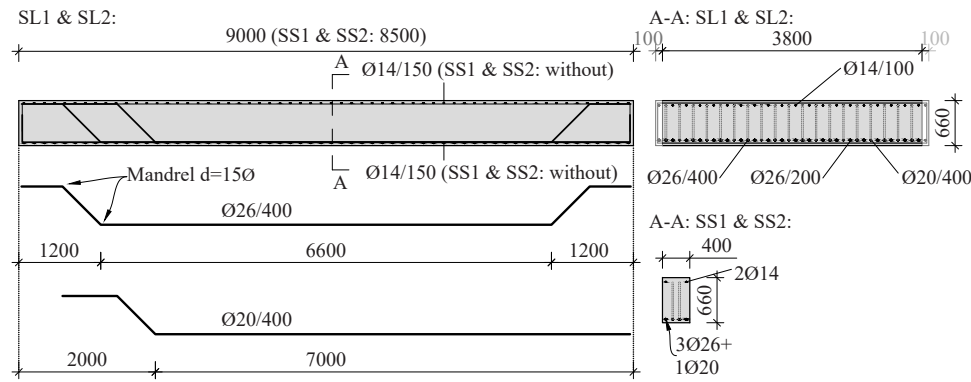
Reinforcement layout of the tested slab and the slab strips from [16].
